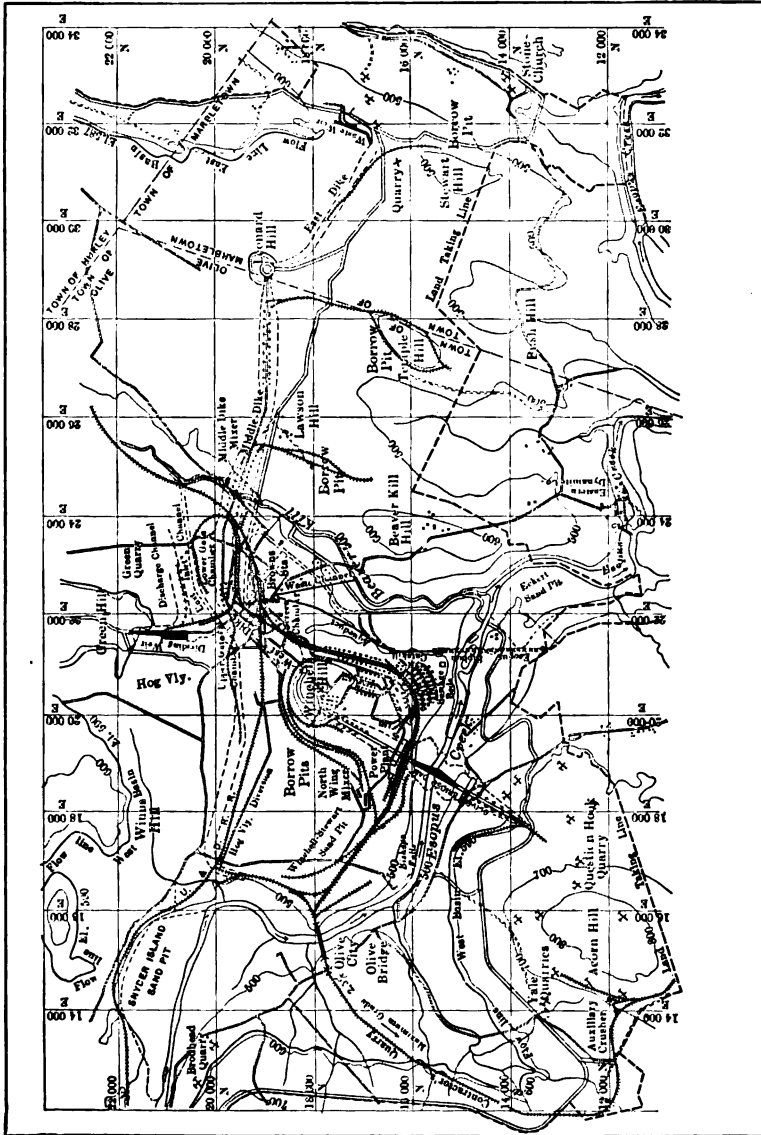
Contract 3. Layout of Contractor's Plant and Railways, Showing Location of Camp, Borrow-pits, etc.
